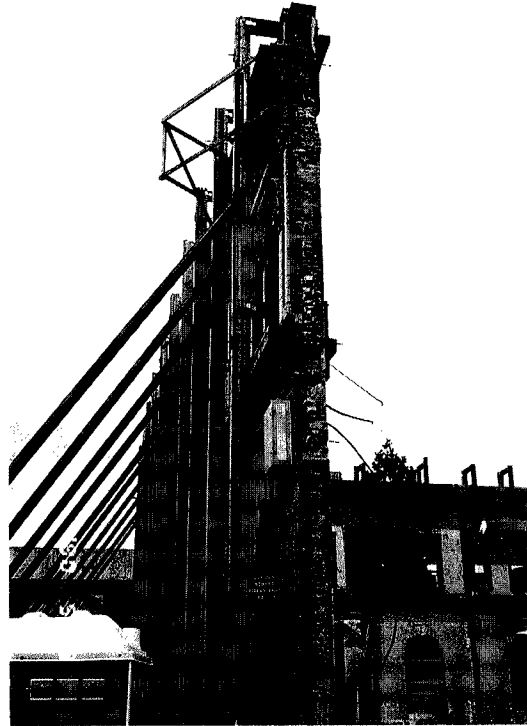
A bank building in Santa Cruz. It has been demolished, but its exterior walls are to be used in reconstruction.
